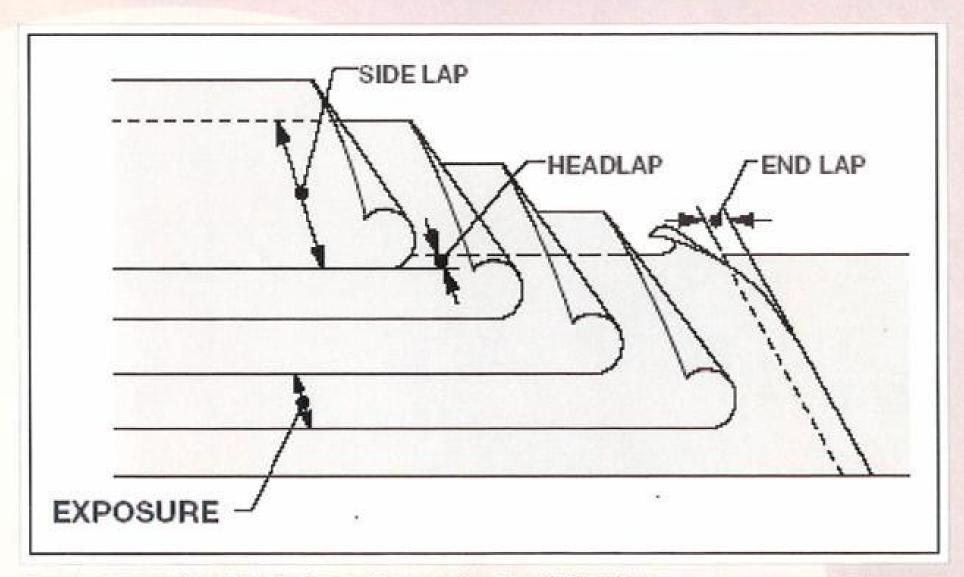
Courtesy of the NRCA Roofing and Waterproofing Manual Fifth Edition
